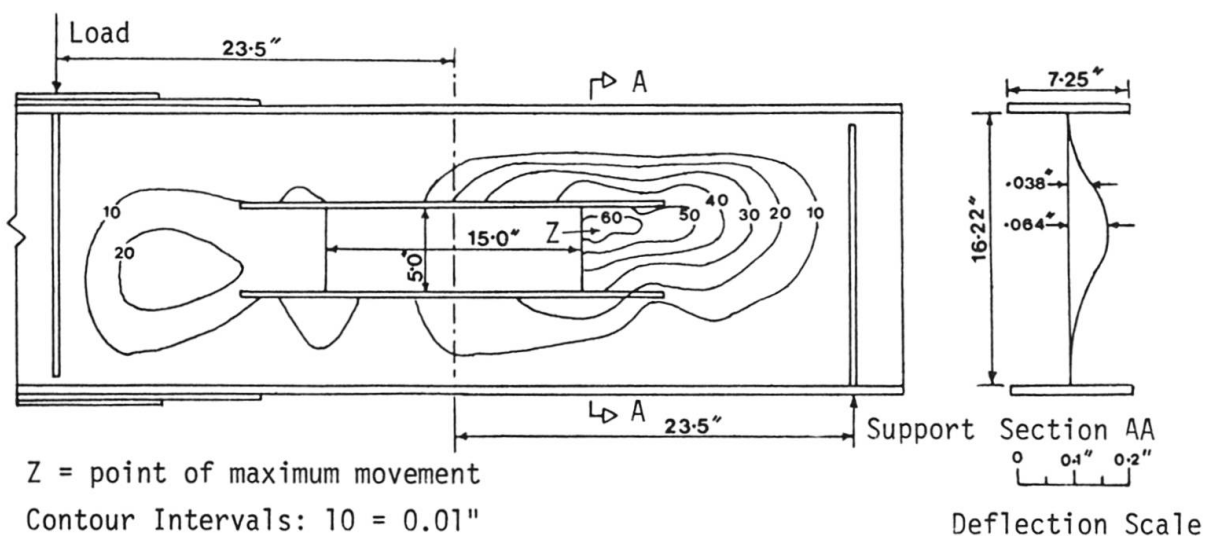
Web deflection contours at 160 kips; beam VB-3.
